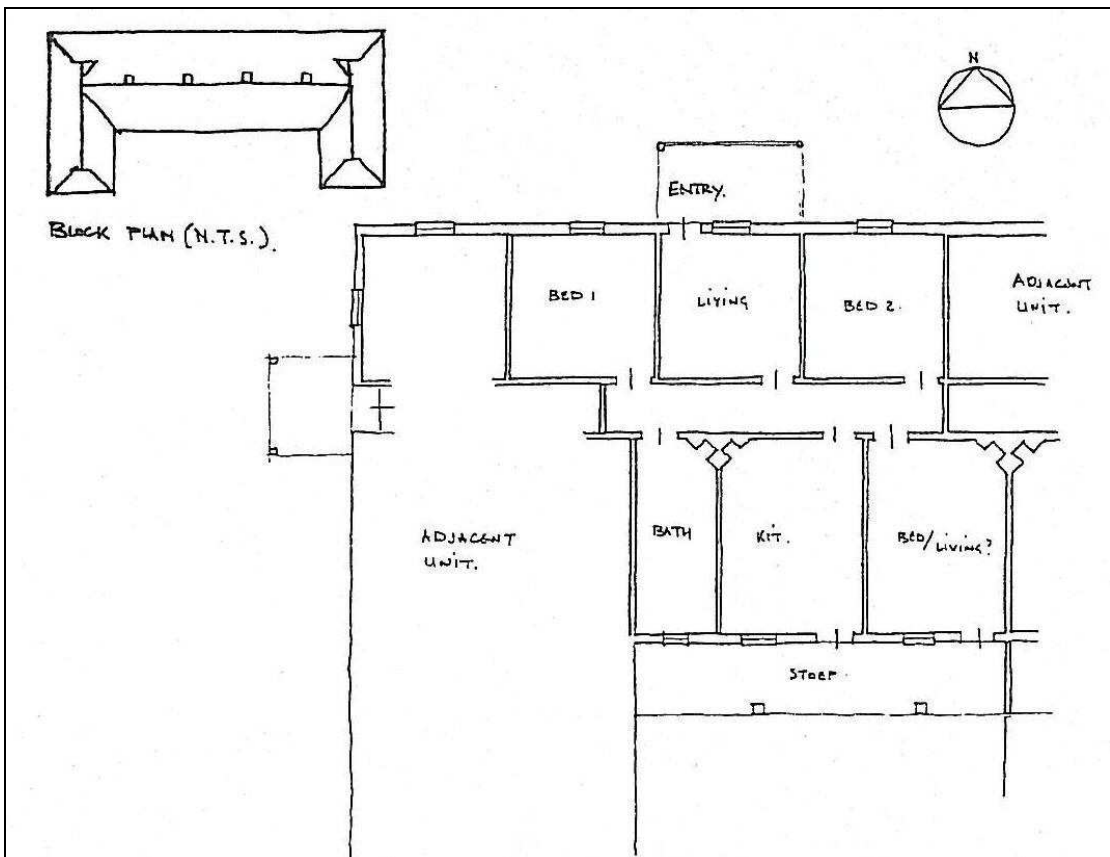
General roof plan of double storey housing units at ERPM (Radford, 1990).
